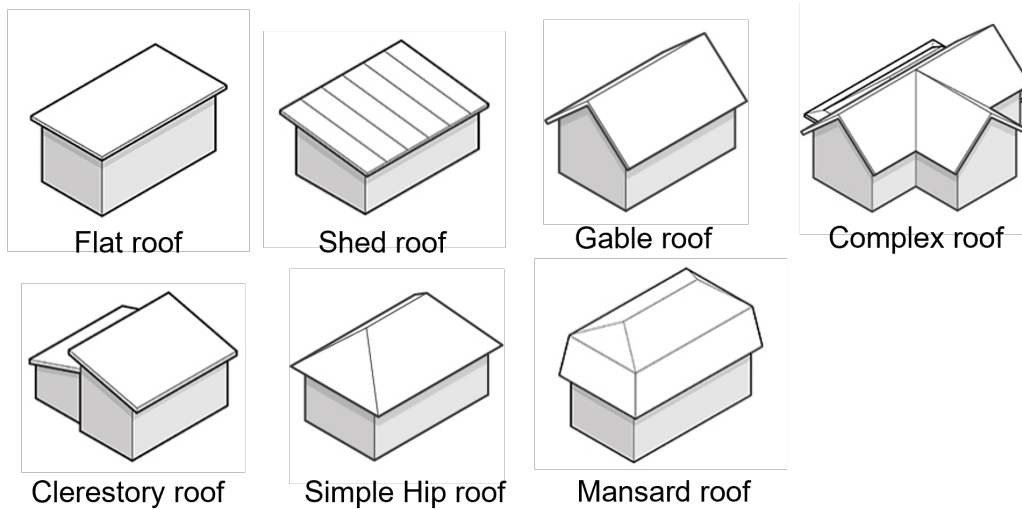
7 Roof Types. Source: <https://jtcroofing.co.uk/>
